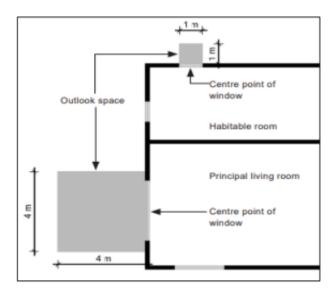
outlook space requirements for development containing up to three dwellings (H5.6.12.A1)
